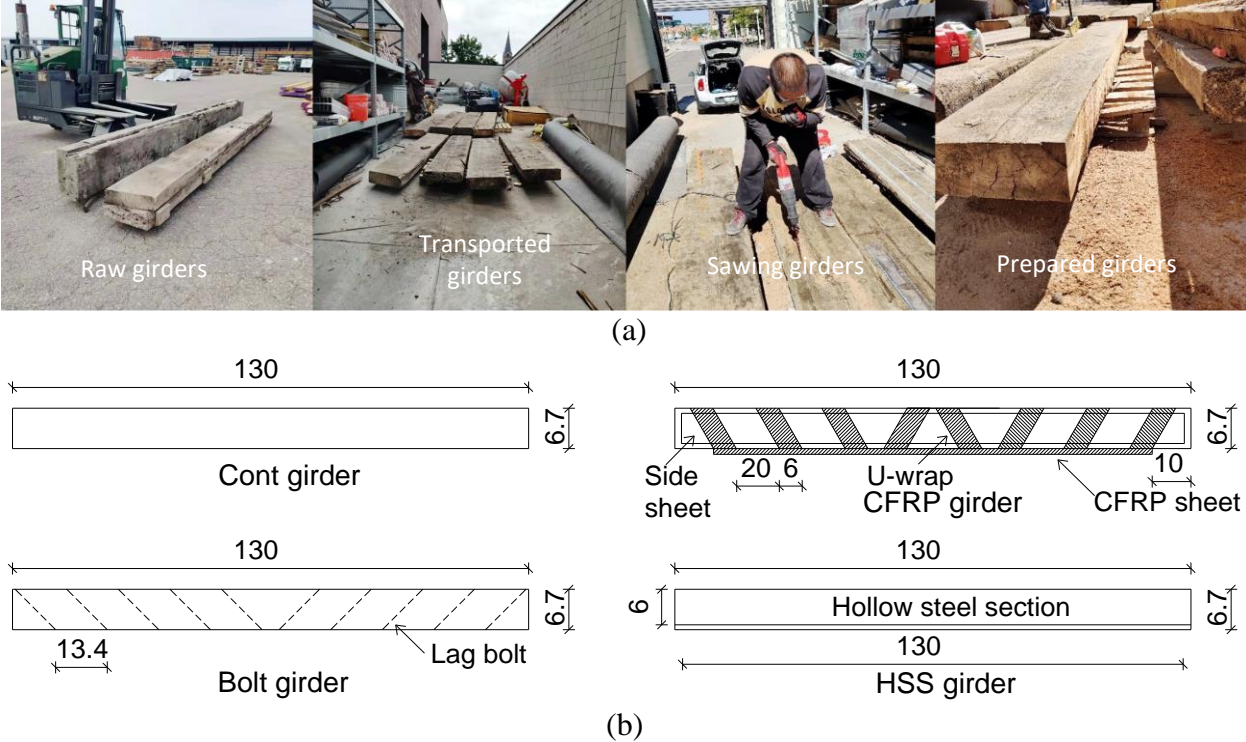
Preparation for laboratory testing: (a) salvaged timber girders; (b) control and retrofitted girders (units in in.)
